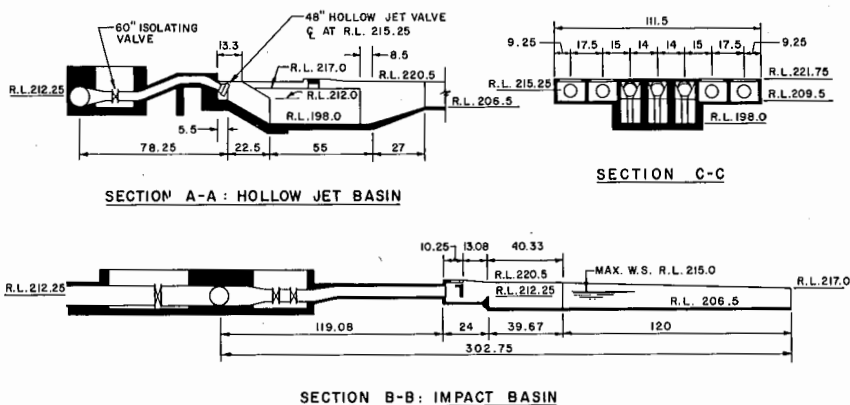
B — The Warragamba Pipelines Stilling Basin - Sections
